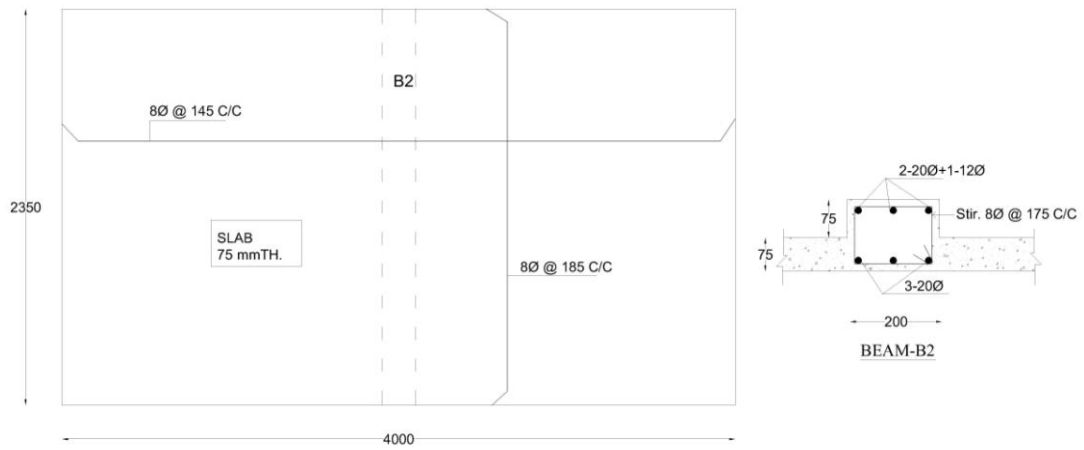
Reinforcement Detailing of Slab, 2PSR
